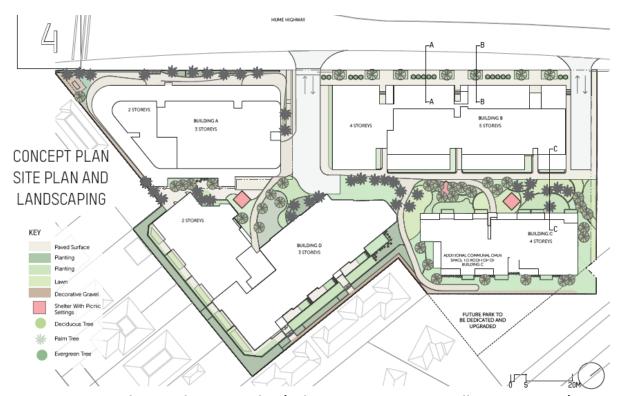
Proposed Revised Concept Plan (Urban Design Report, Squillace, June 2020)
